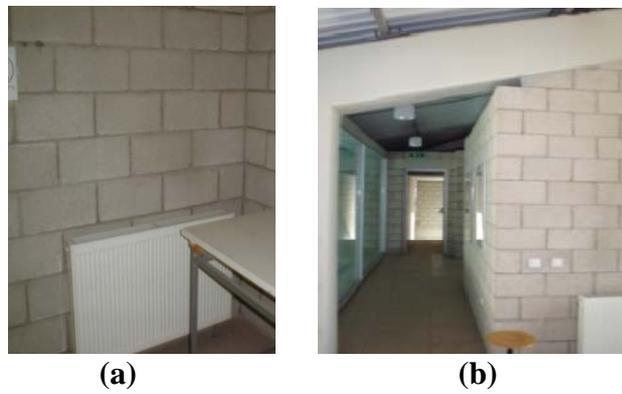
a. DC-15 at fire exit on the mezzanine floor of the MATPUM Building
